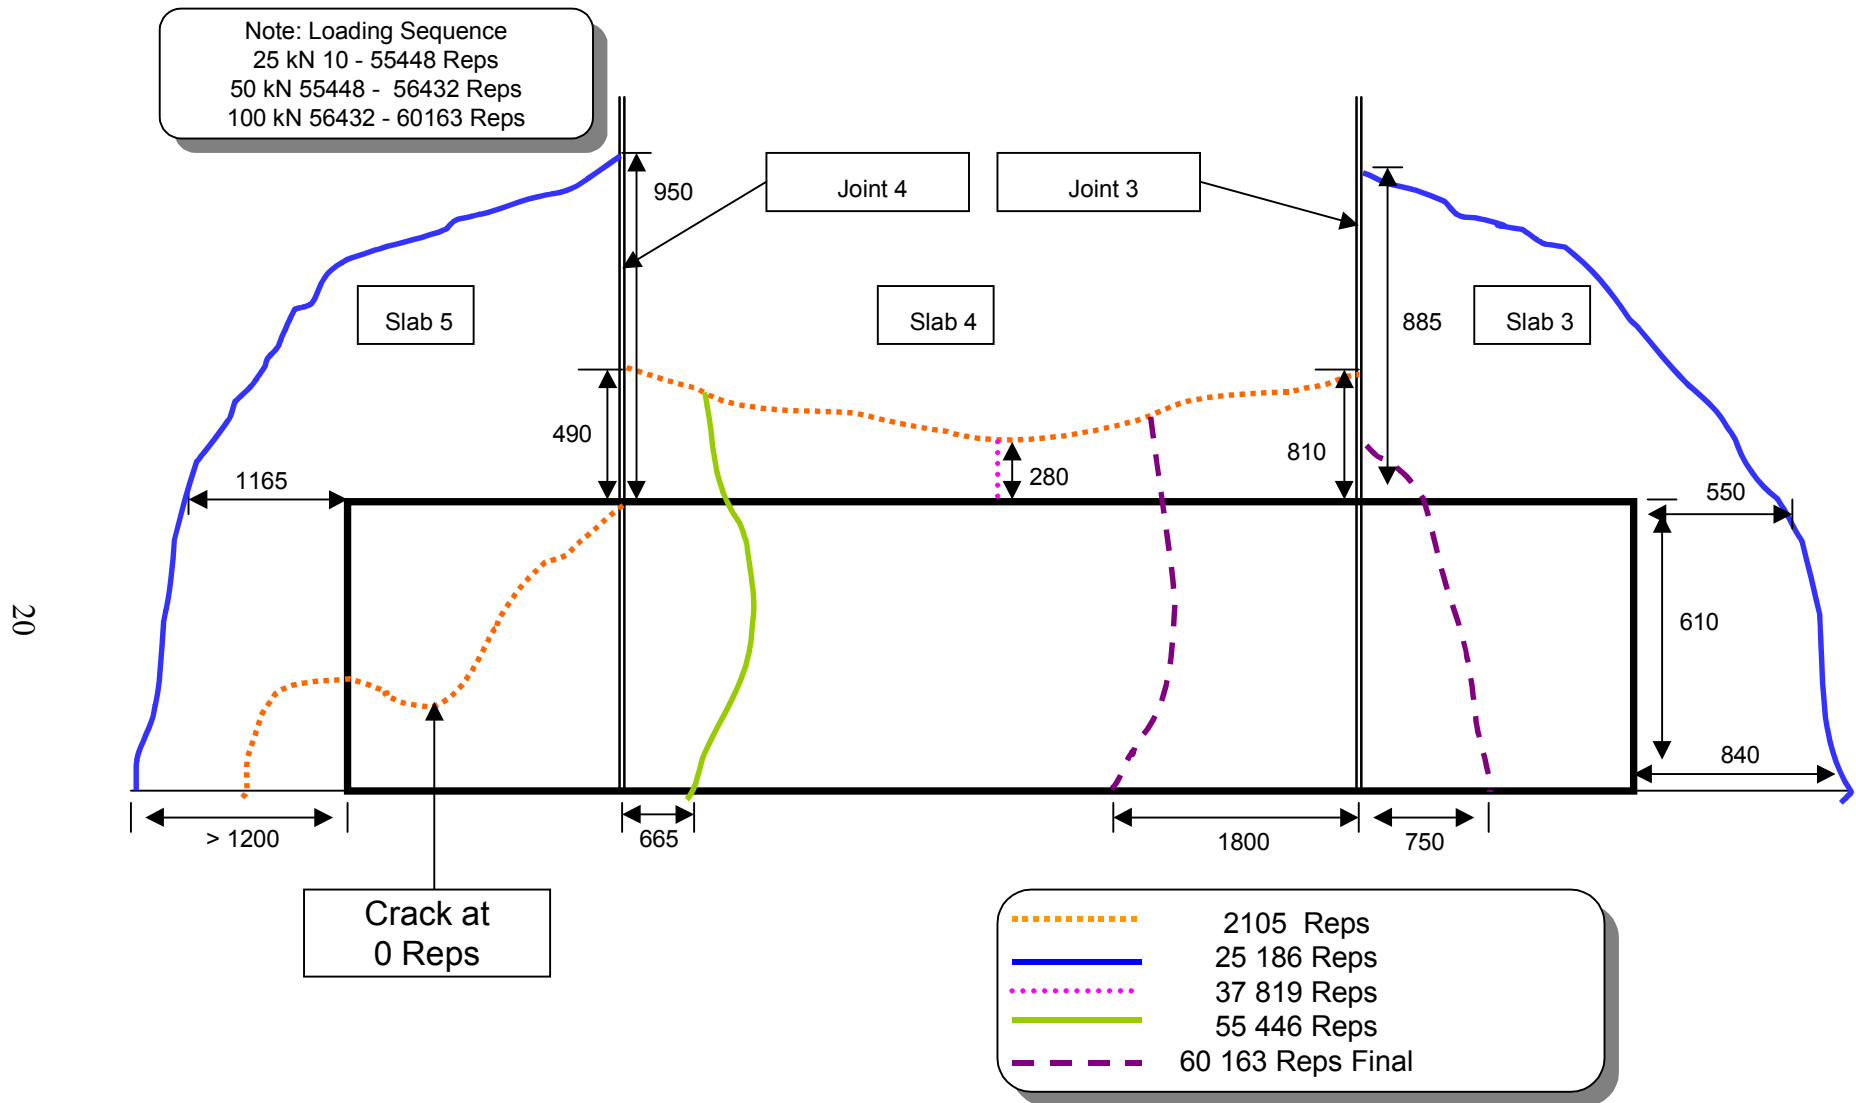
Schematic of crack development, Test Section 519FD (not to scale).
